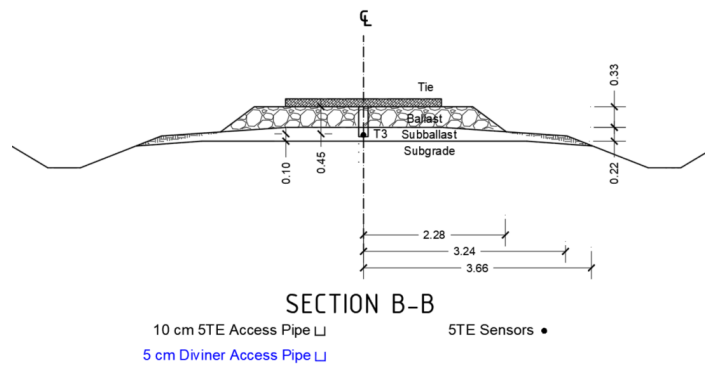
Cross-section of control section: access pipe at sub-ballast layer (dimensions in meters).
